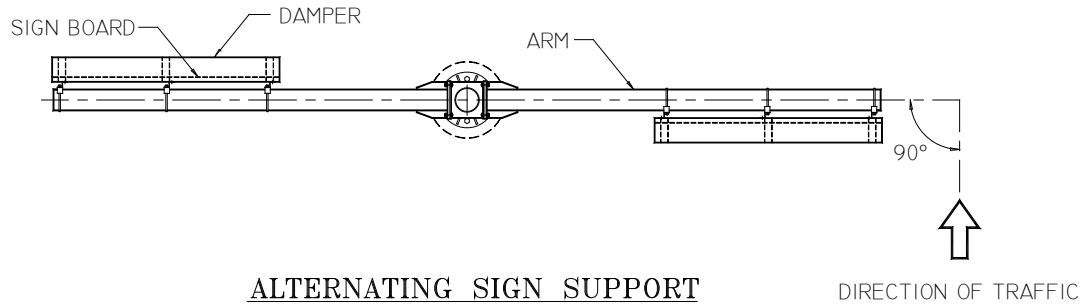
(C) TYPICAL BUTTERFLY LAYOUT PLAN
